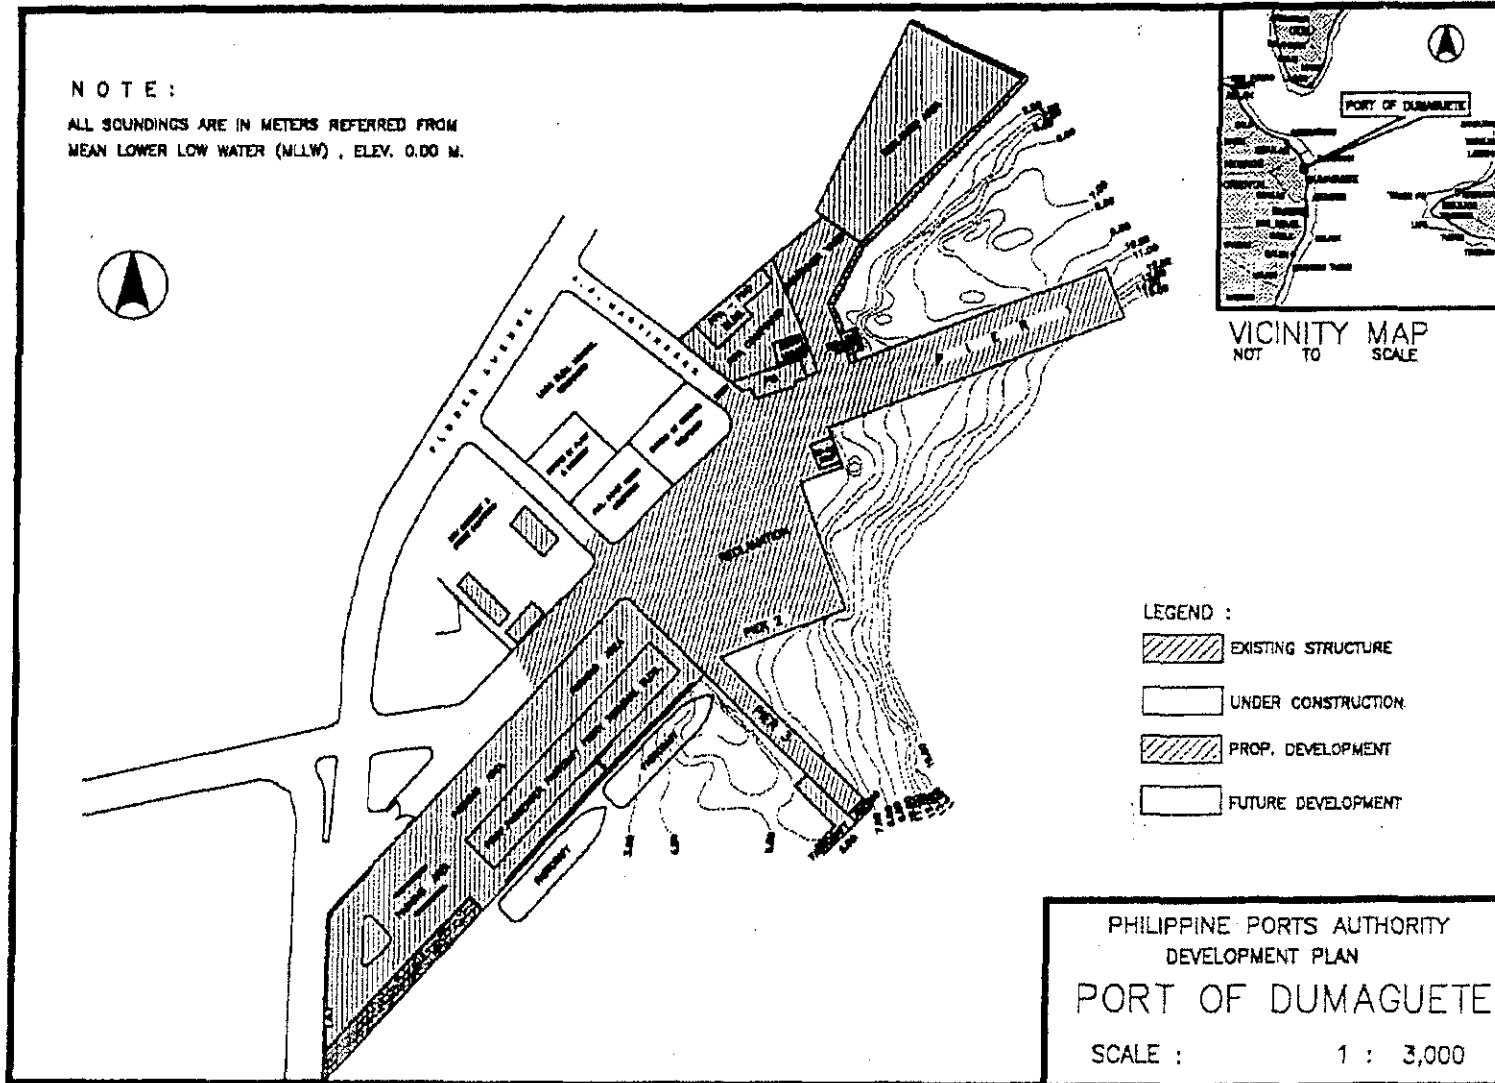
Development Plan - Port of Dumaguete
